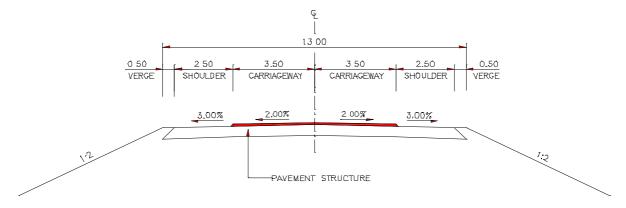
The Typical Cross-section of The Connecting Road in The Lao PDR
